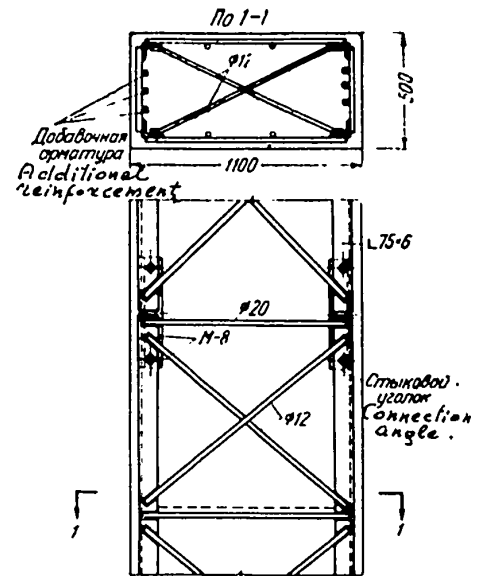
Joint of the welded steel skeleton of a column.
